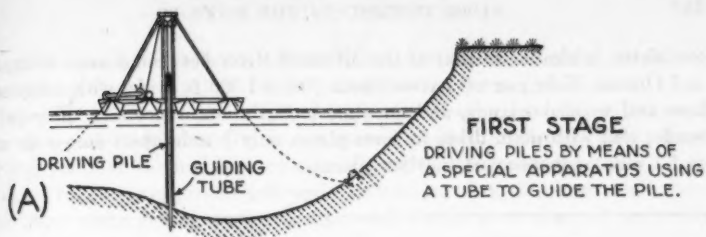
BANK PROTECTION AND TRAINING WALL FOR RIVER PO.
